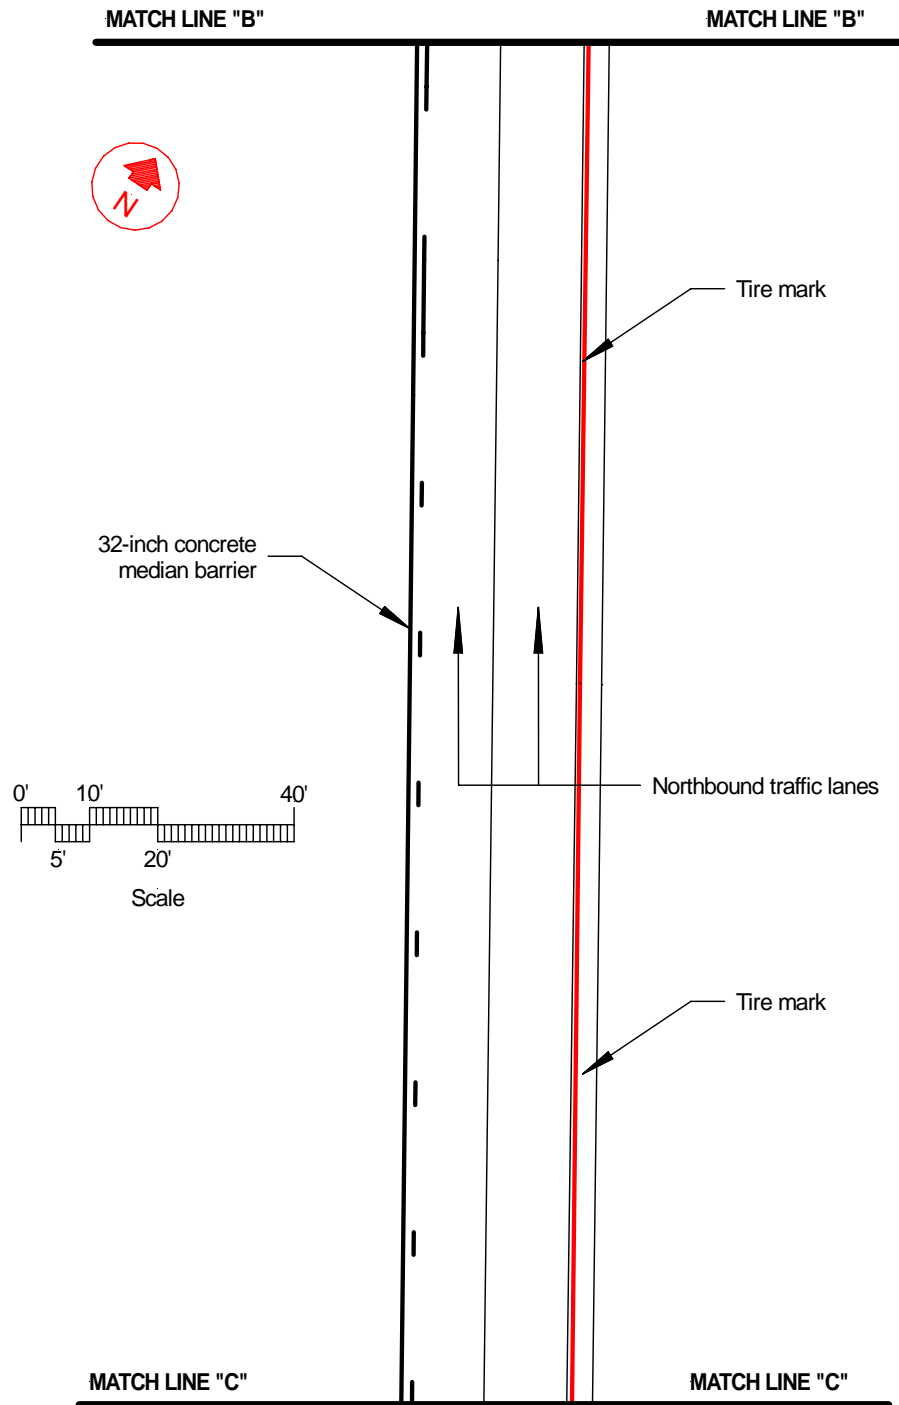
NTSB map of B-C pavement markings and roadway evidence.
